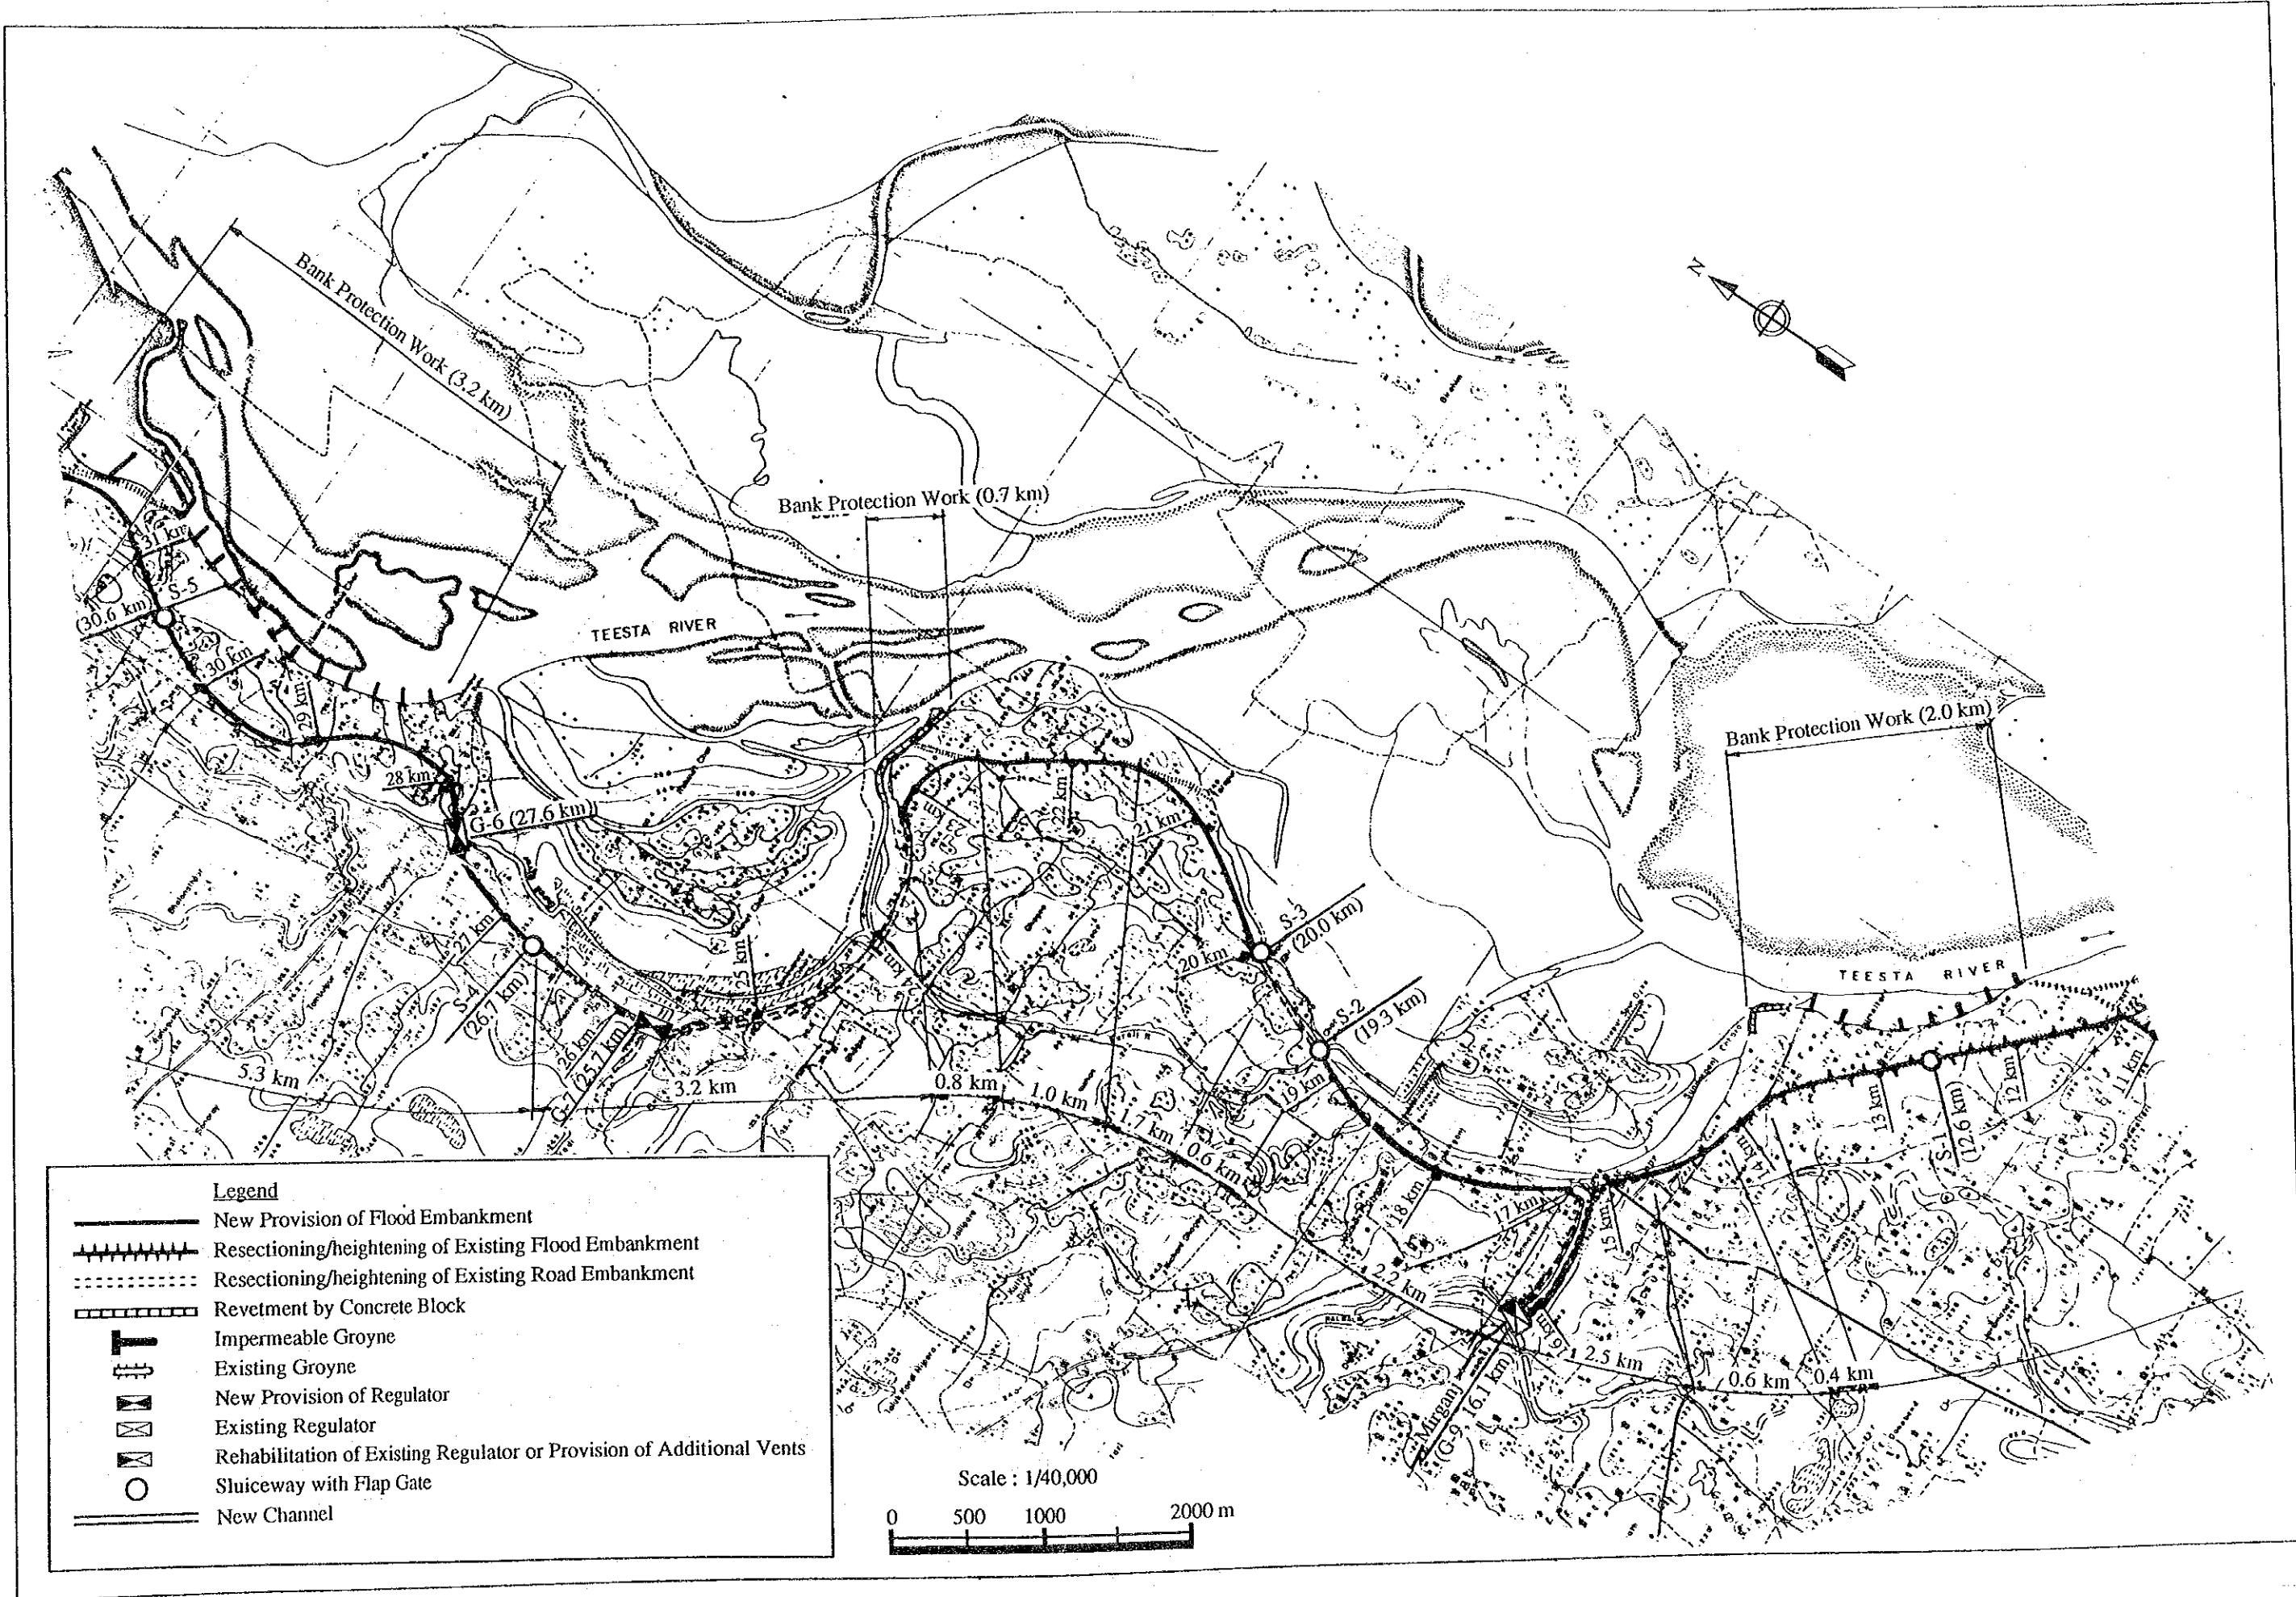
PROPOSED ALIGNMENT OF FLOOD EMBANKMENT AND LOCATIONS OF THE FCD STRUCTURES ALONG THE TEESTA (3/3)
